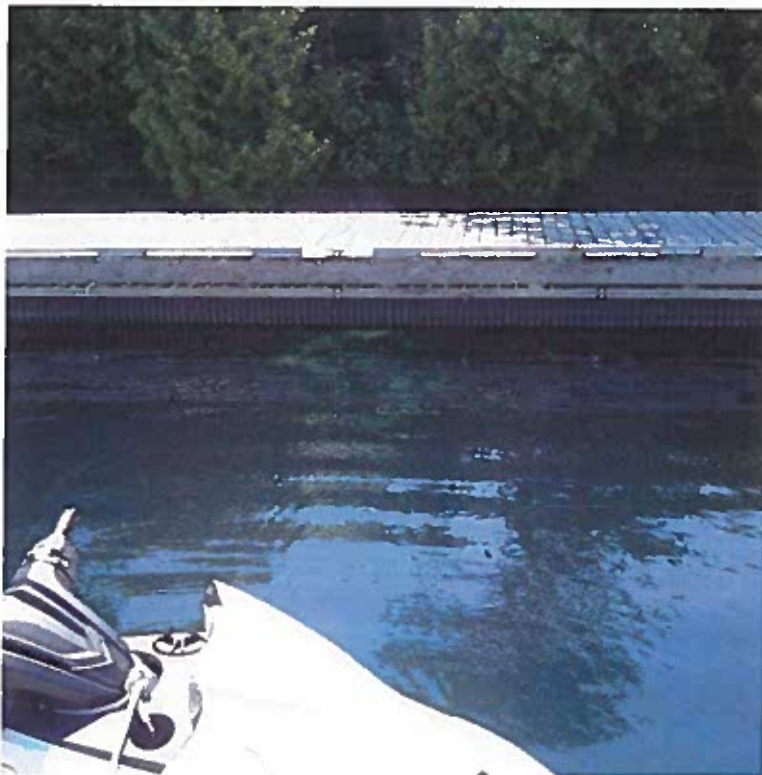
Wooden Jetty, Looking South Across the Alley from the Steel Alley Dock
